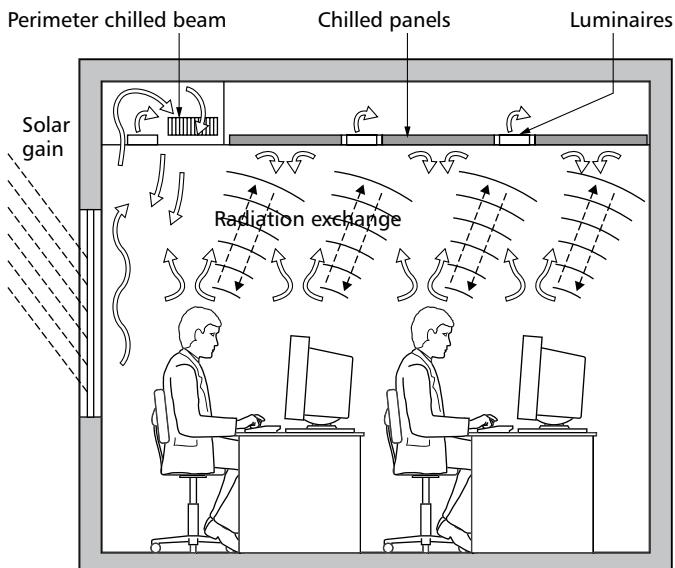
Typical ceiling layout incorporating chilled panels and chilled beams
